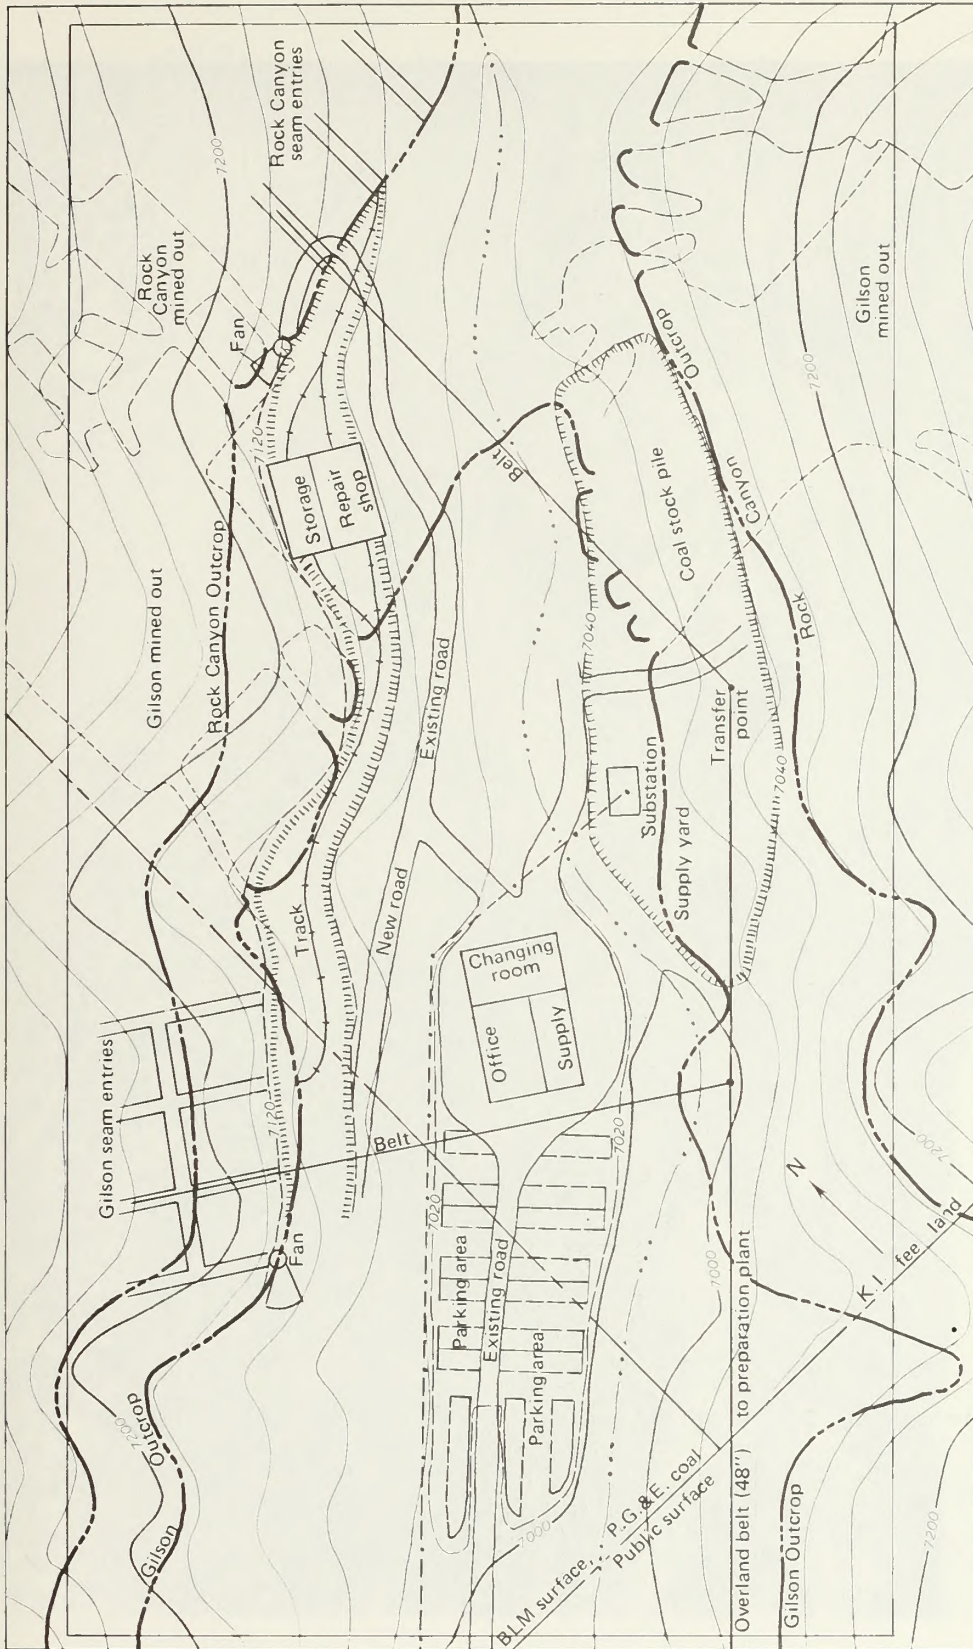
Proposed layout of surface facilities at the Dugout Canyon minesite in sec. 23, T. 13 S., R. 12 E., including topography.
